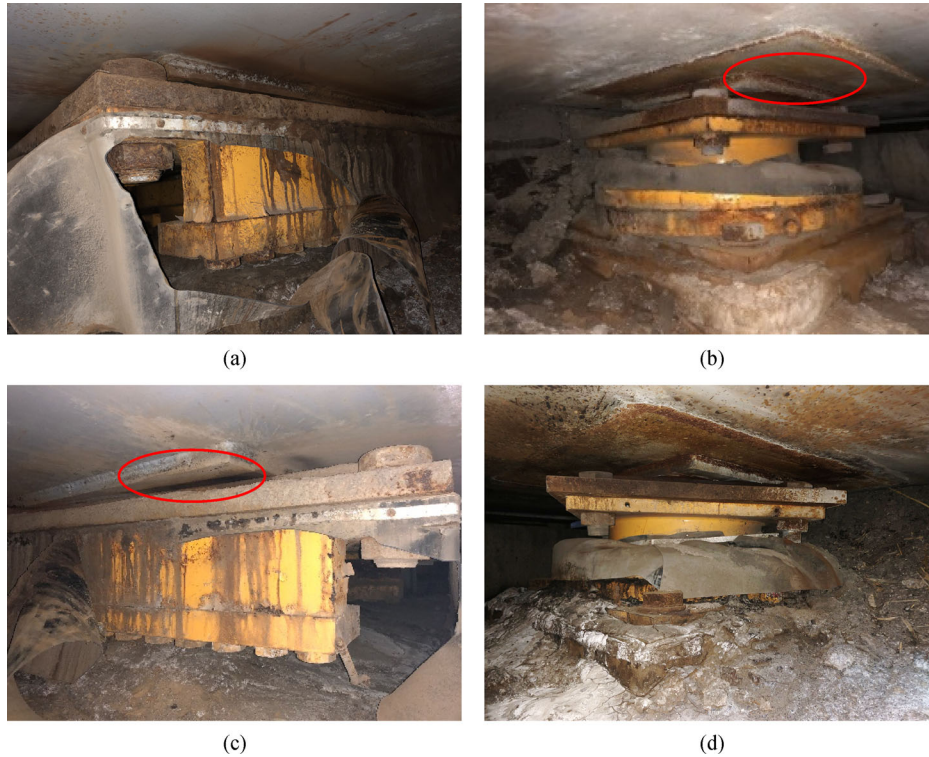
Diseases of the steel box girder support. (a) Corrosion of the steel plate (the West middle support); (b) weld cracking and partial detachment (the West-North side support); (c) weld cracking and partial detachment (the West-South side support); (d) larger residual deformation and position deviation (the East-North side support).
